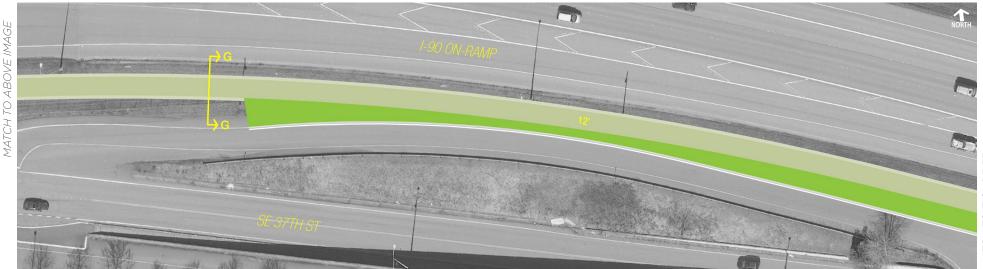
Trail travels behind the Pizza Hut, 76 Gas Station, and vacant commercial building before reconnecting with SE 37th St at 156th Ave SE.
